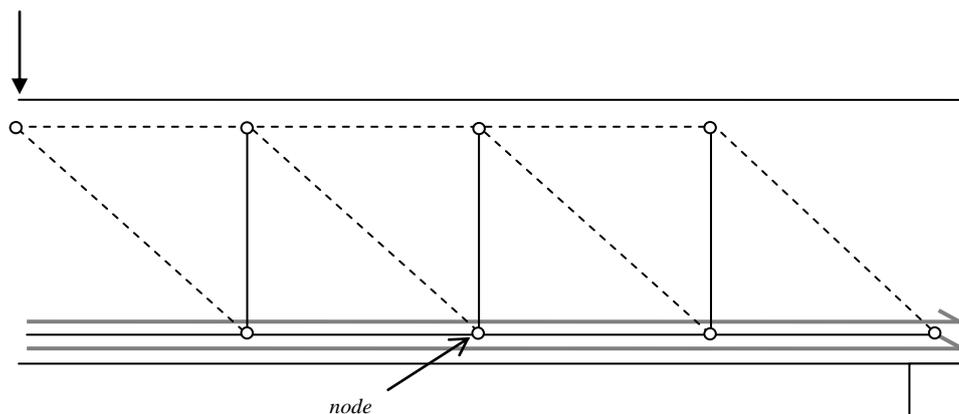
Truss model of a beam with the node point placed between the longitudinal reinforcement layers. The node does not indicate that the shear reinforcement must be extended to enclose all longitudinal reinforcement.
